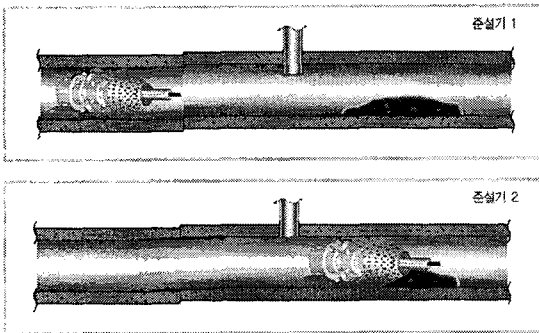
Sketch of boring in sewer by rotating cutter tool.
